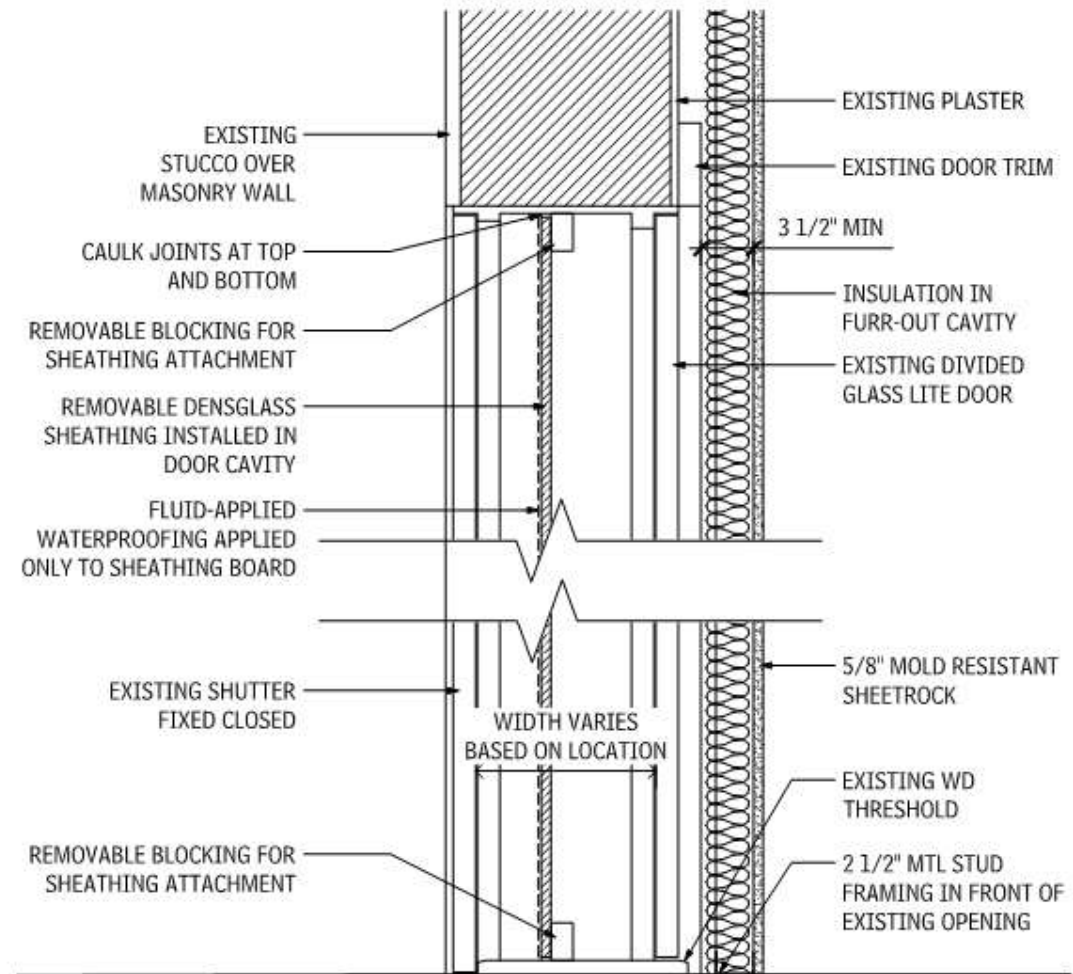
IS APPLICABLE TO THE FOLLOWING OPENINGS:
